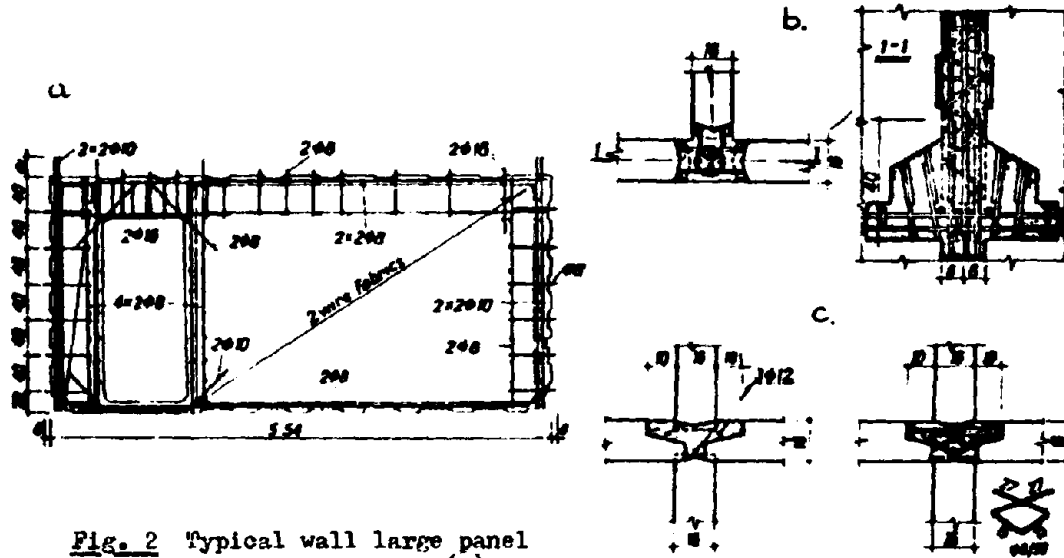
Typical wall large panel with door opening (a). Vertical (b) and horizontal (c) connections.
